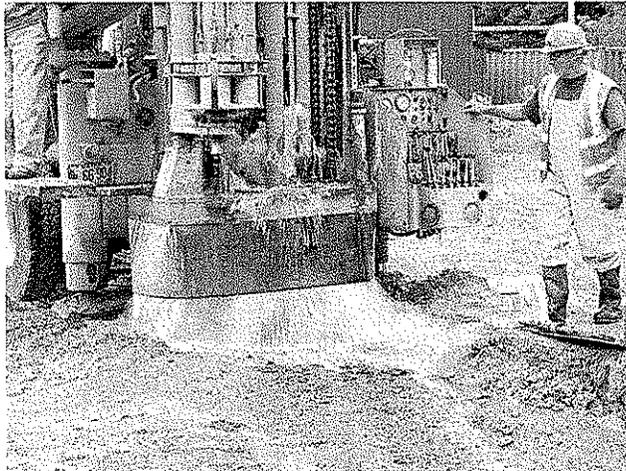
Drilling through a fracture, view southwest on the geothermal bore field. September 8, 2010.
